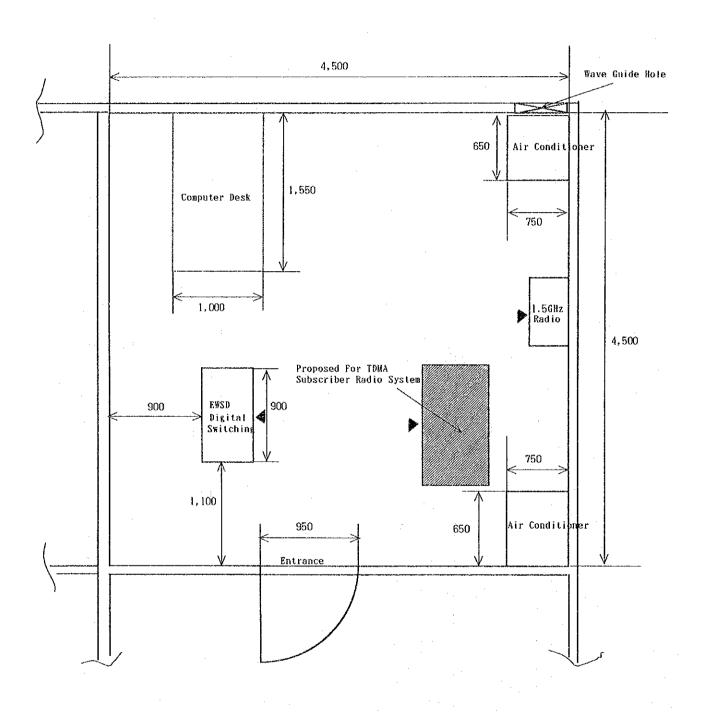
Equipment Layout Plan for SIMUNYE Exchange Office
